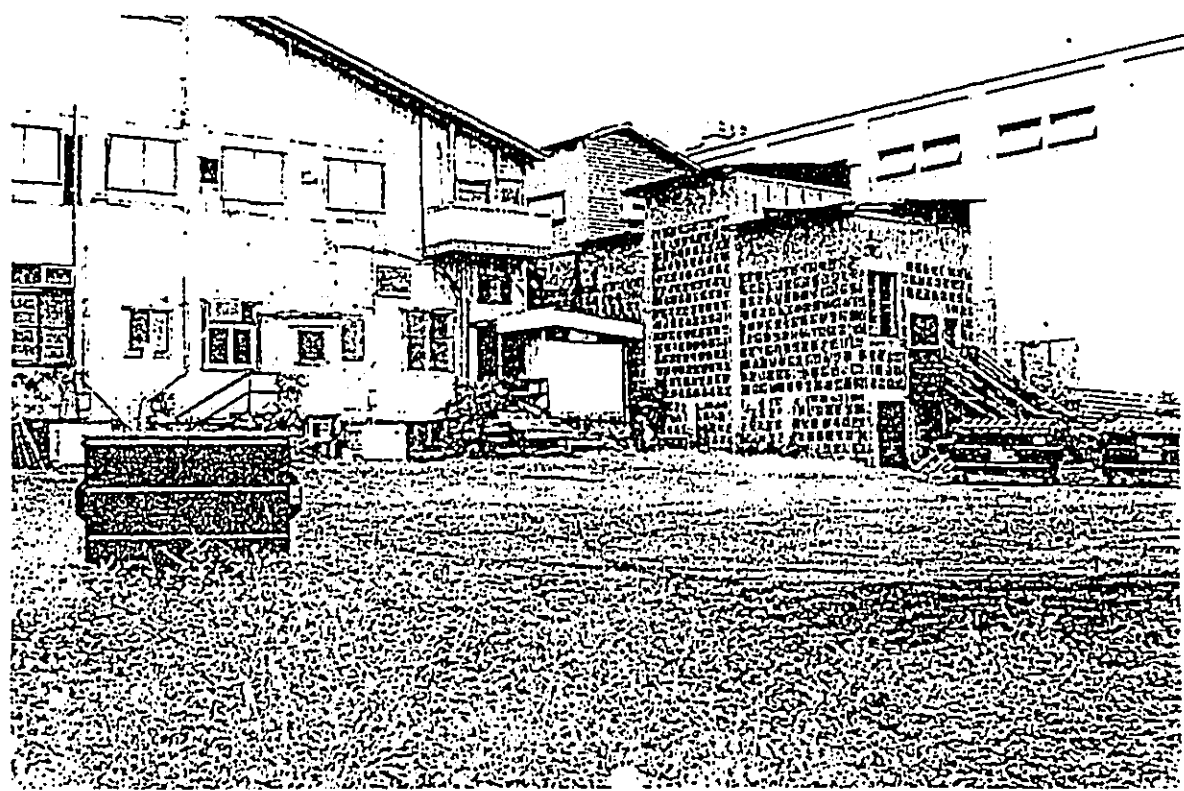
Overview of SE Quadrant and Building (Red Tiled) to be Renovated,
